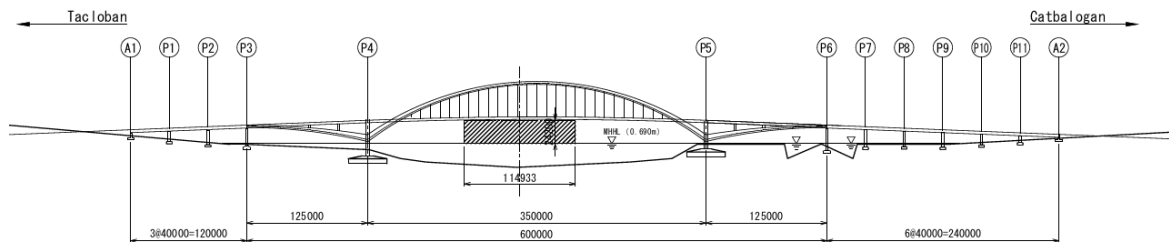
2nd San Juanico Bridge Plan (Arch Bridge)
